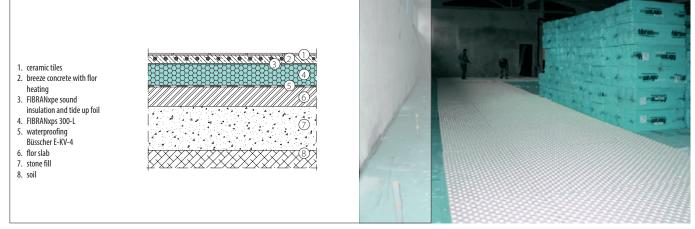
Protection of foundation and floor slab. Execution of waterproofing before the installation of thermal insulation FIBRANxps 300-L.
